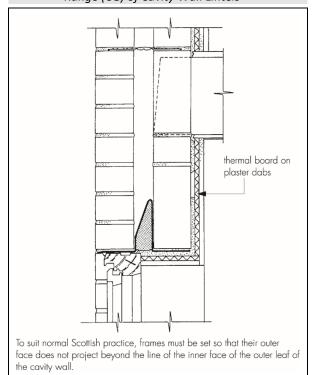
Alternative details for Catnic Cougar Range (CG) of Cavity Wall Lintels
